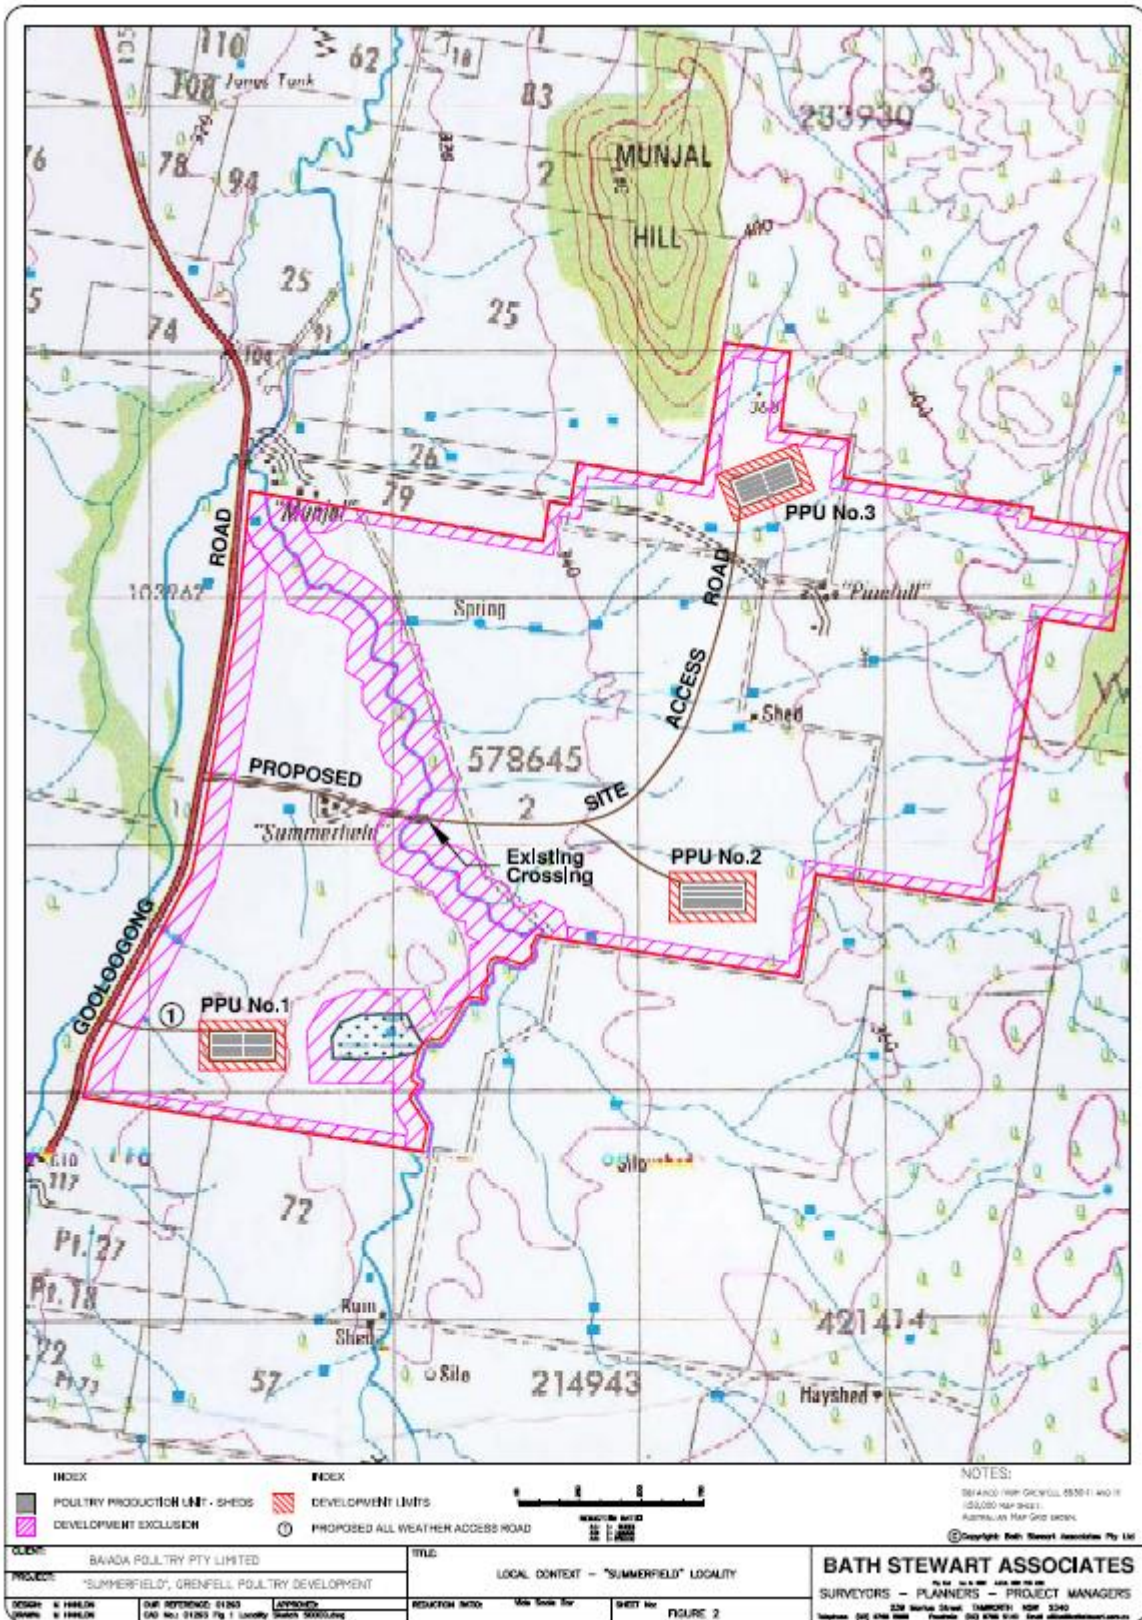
Existing approved plan layout (Bath Stewart, 2015)
